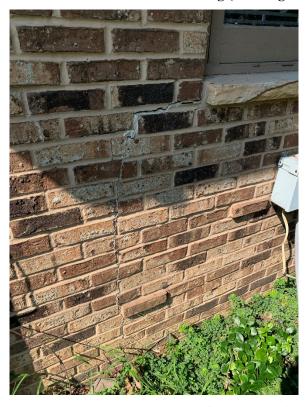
Crack in Brick Façade on East Wall of Rear Addition (Looking West)
